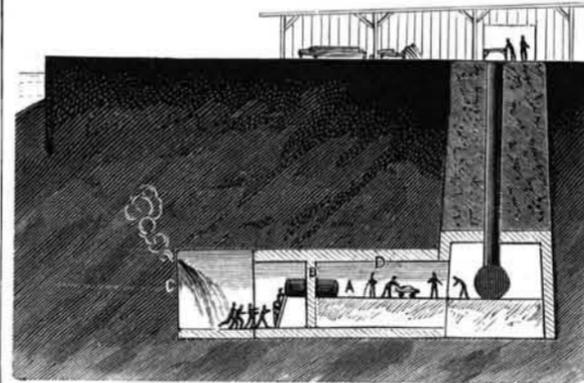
SECTION OF THE TUNNEL, CAISSON, ETC.
